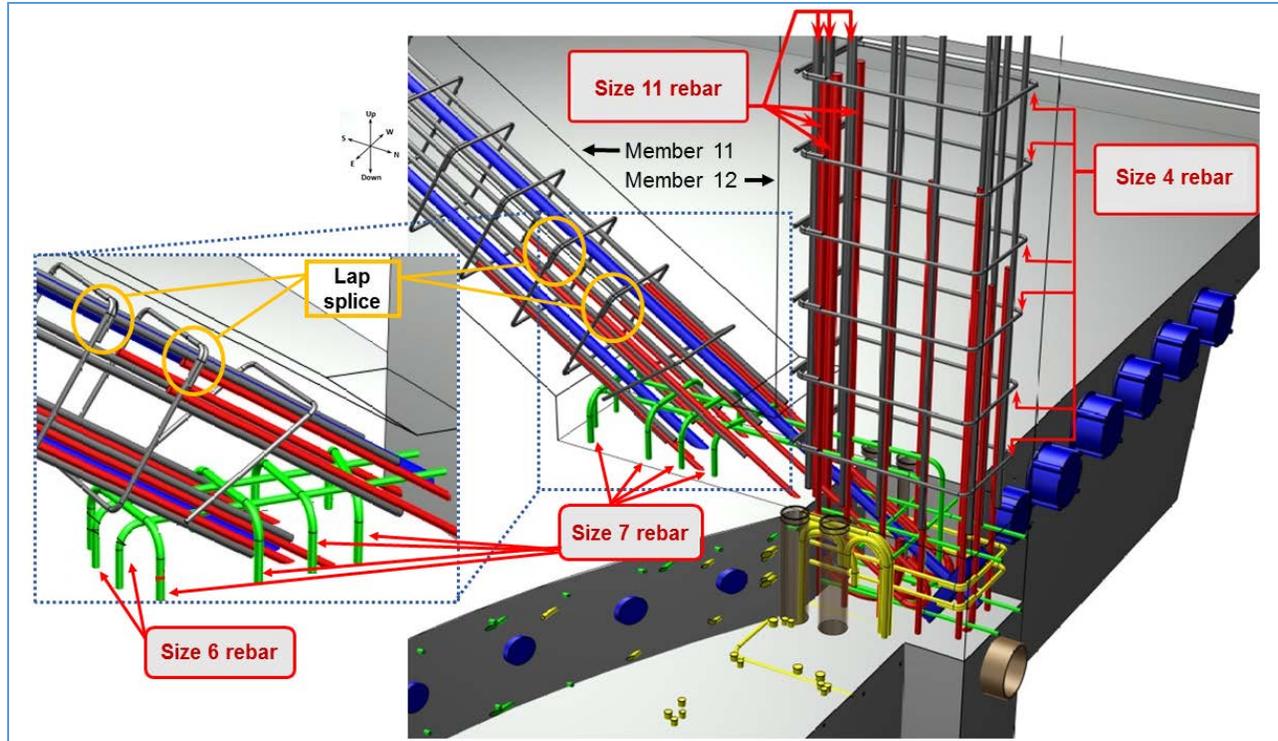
Main span, north end, showing rebar detailing in member 11, member 12, and node 11/12. Inset shows another view of rebar in node 11/12 and detail of lap splice from member 11. (Source: FHWA 2019)
